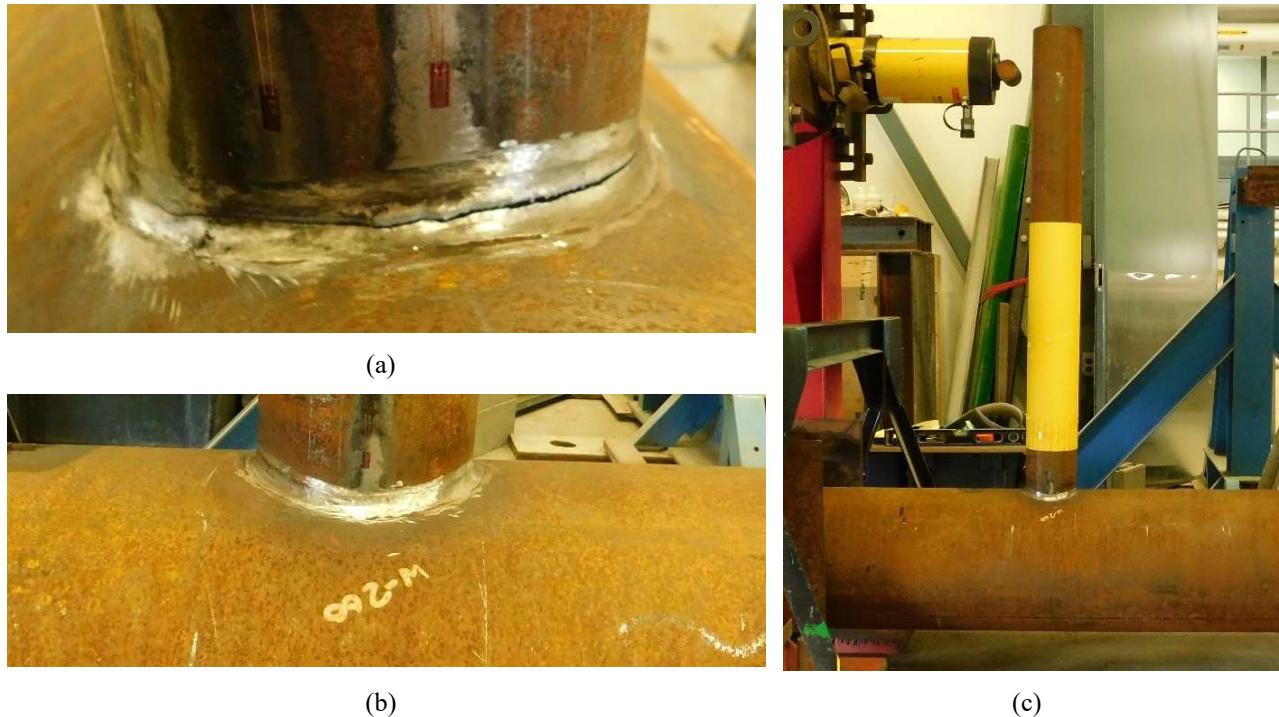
Failure of T356-127-1 (a) weld fracture, (b) chord deformation and (c) branch deformation
